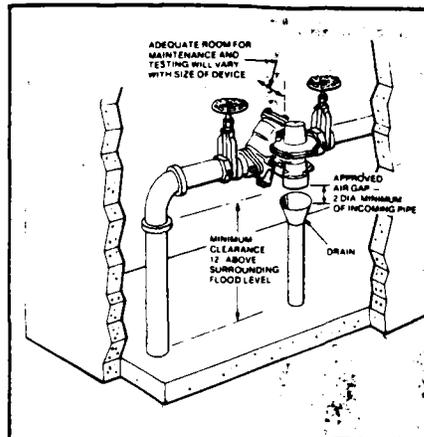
TYPICAL INSTALLATION IN BUILDING
